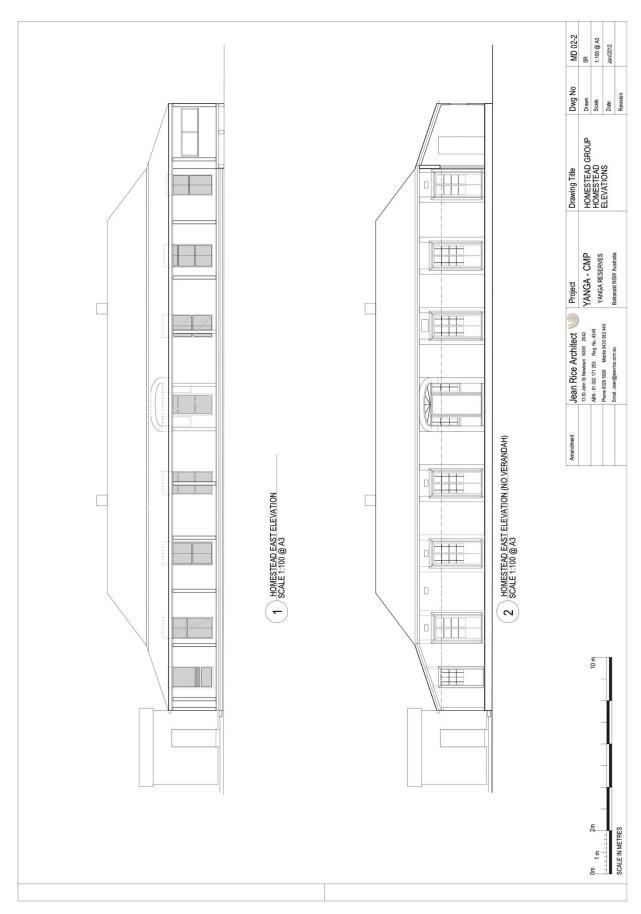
Homestead Group Main Building Elevations. Jean Rice Architect, site assessment 2009.
